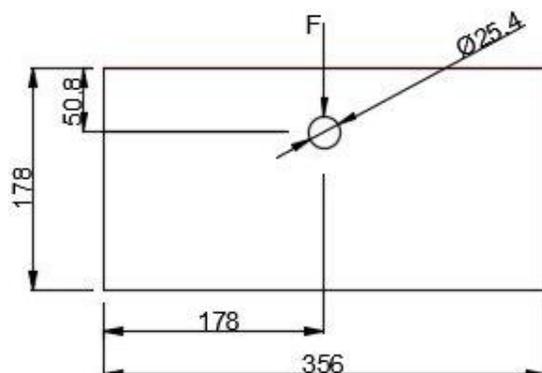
Perpendicular to the grain specimen (dimensions in mm)
